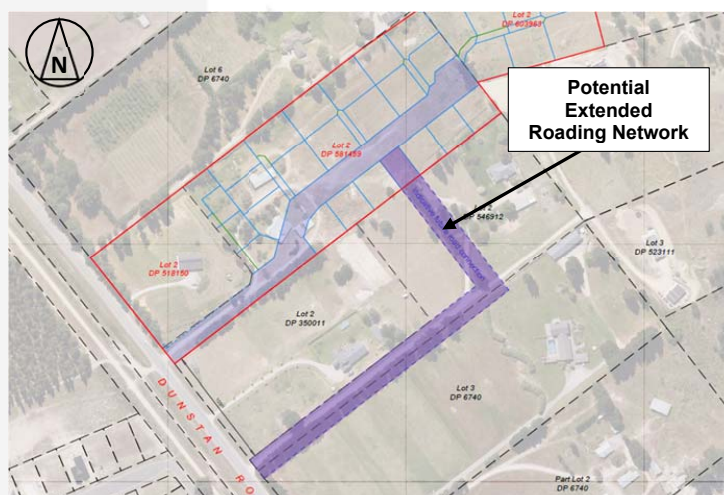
Potential Expansion of Roading Network (Extract from Calder Surveying Drawing)
